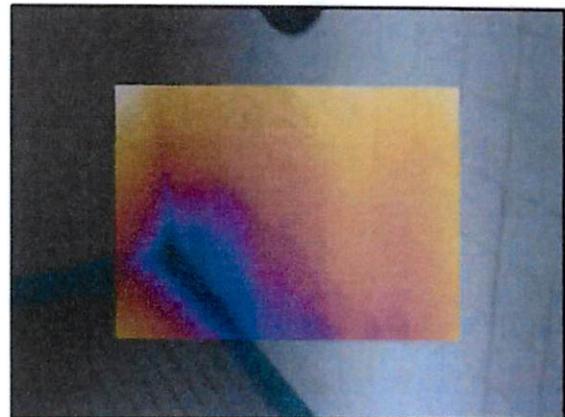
North wing, west Restroom shower area, evidence of residual moisture in wall system as viewed by IR camera
